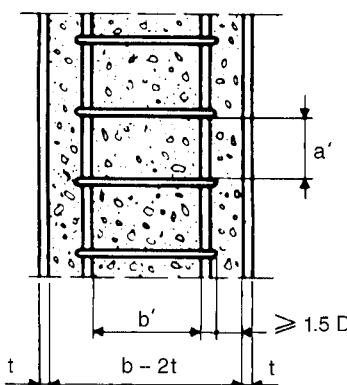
Arrangement of bars and stirrups in concrete filled hollow section columns
